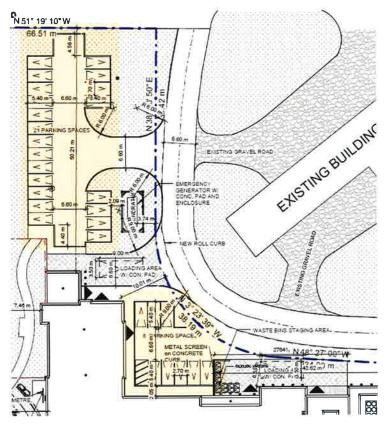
Excerpt from Site Plan showing proposed parking spaces accessed from municipally-owned driveway; Arcadis IBI Group, 2023.
